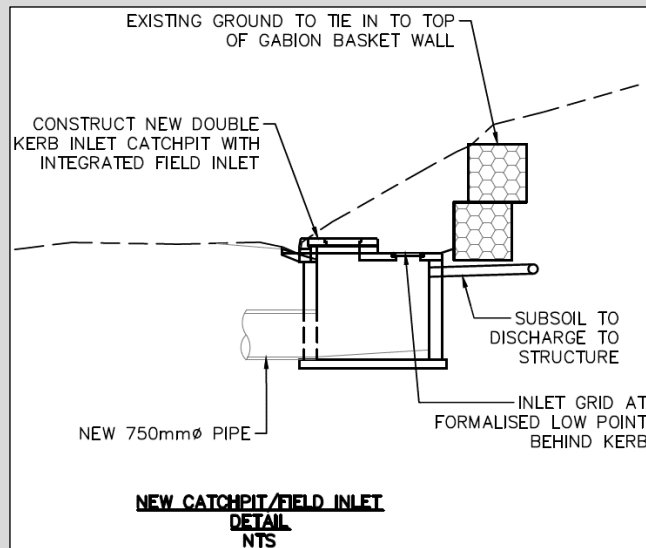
Subsoil drain underneath the 2m high gabion wall to be tied in at a new catchpit / field inlet.
